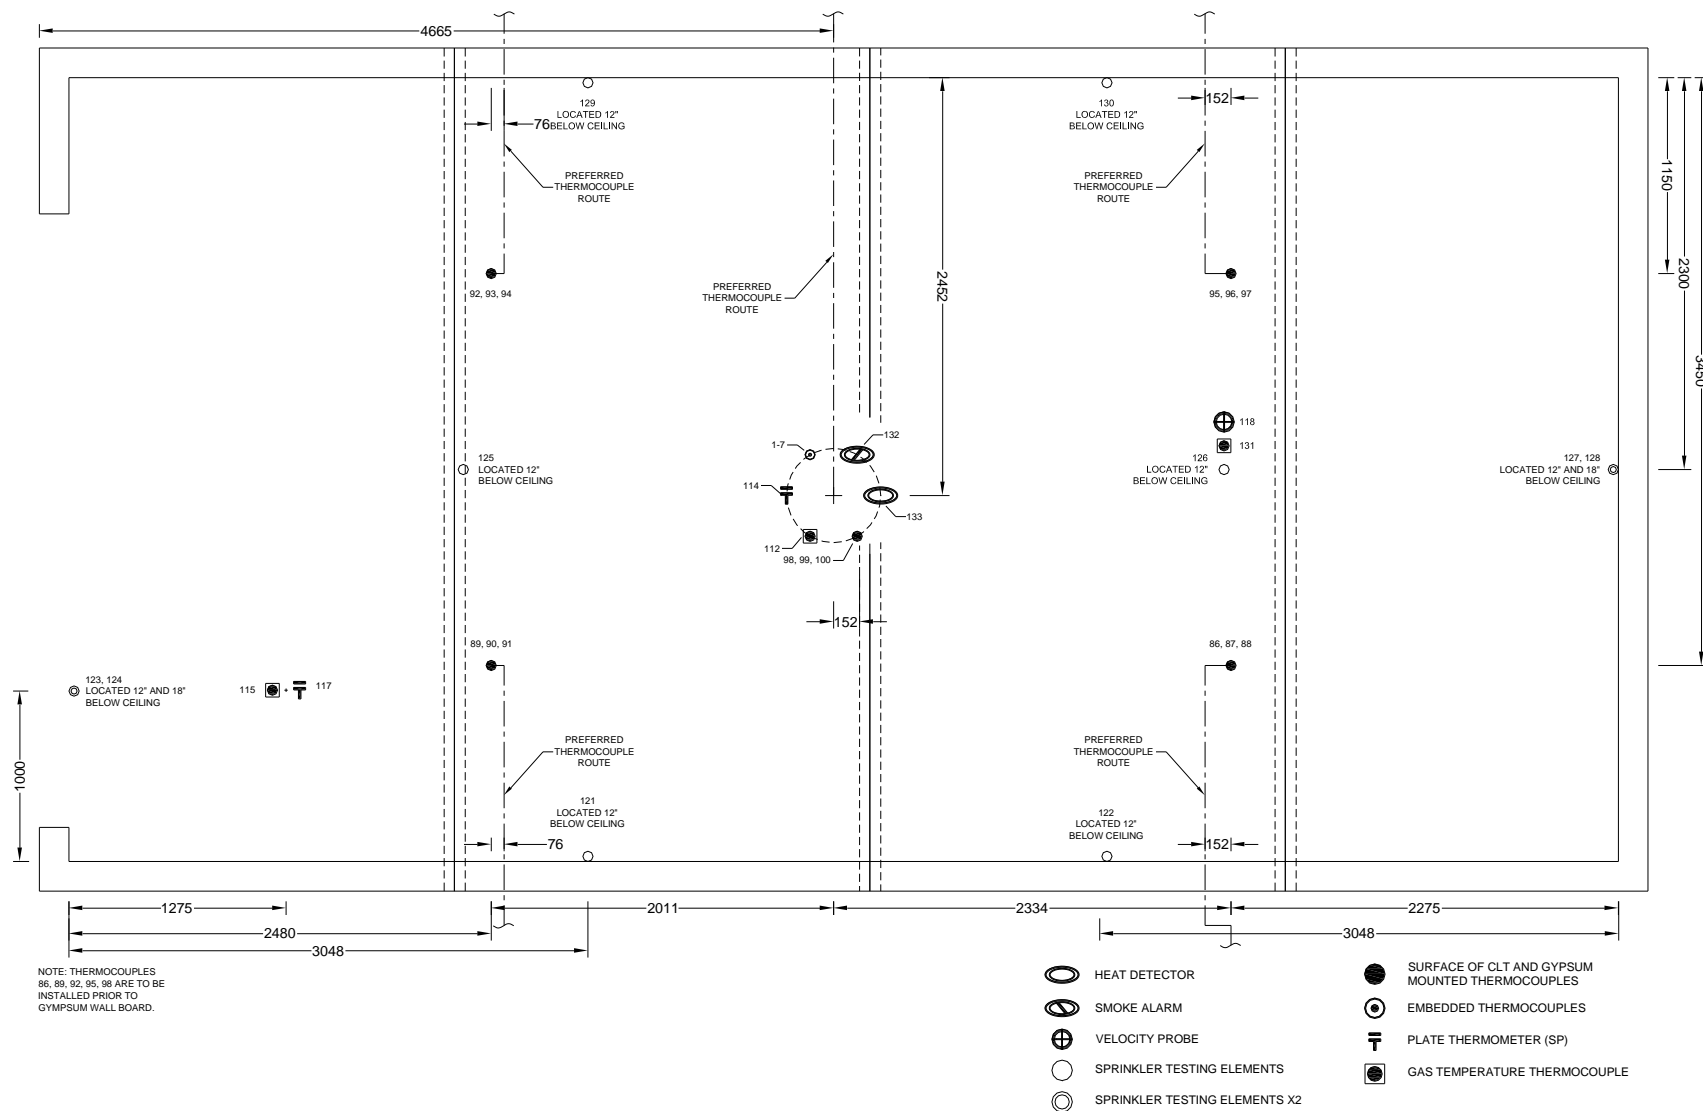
Test 1-2 Large Compartment CLT - W4 - Gypsum Layout - Base Layer
